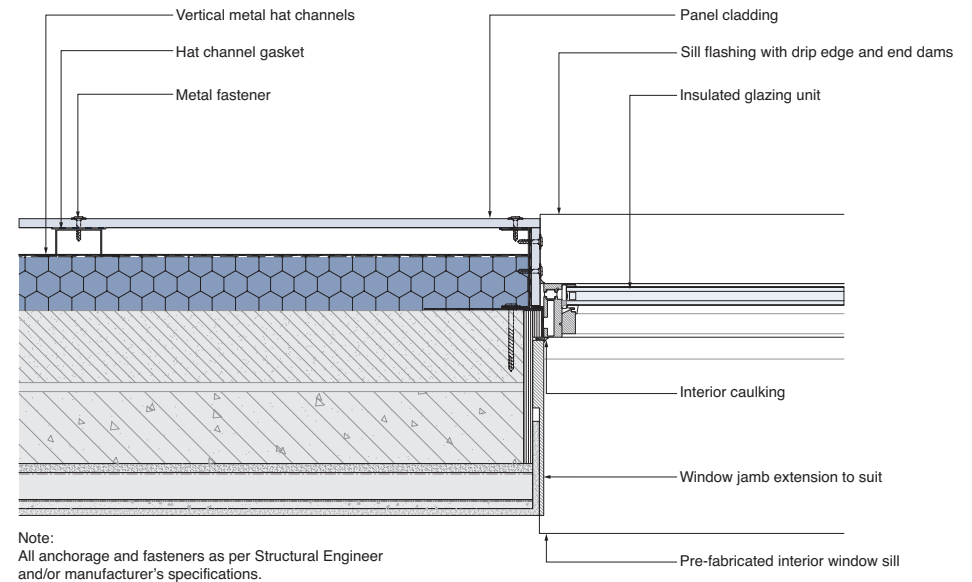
Pre-finished window jamb extensions complement the pre-fabricated window sill to facilitate interior finishing of the retrofit window opening within a single visit, minimizing tenant disruption.
